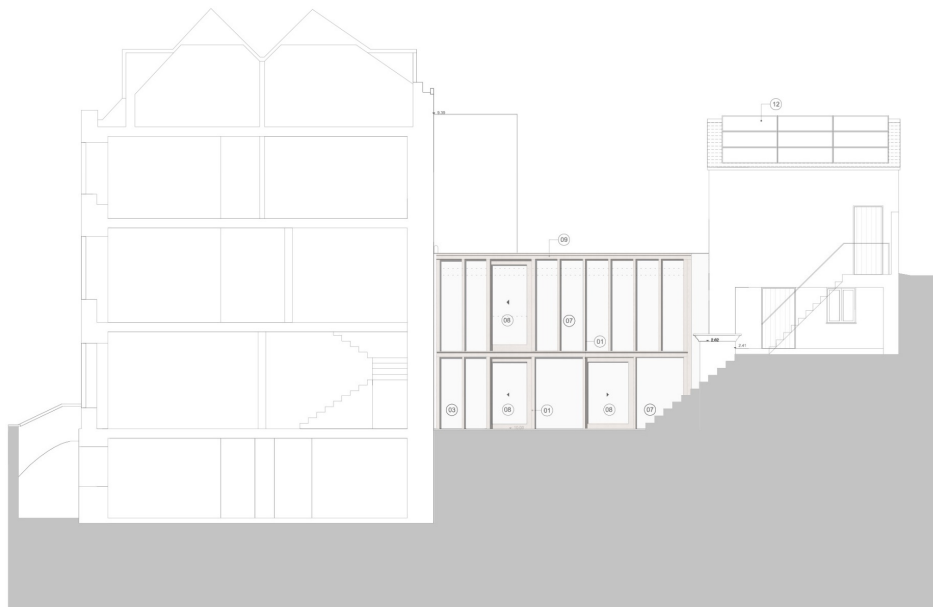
Proposed rear elevation. The extension is subservient in scale to the existing buildings. It is level with the site boundary walls and therefore not visible from the street.
